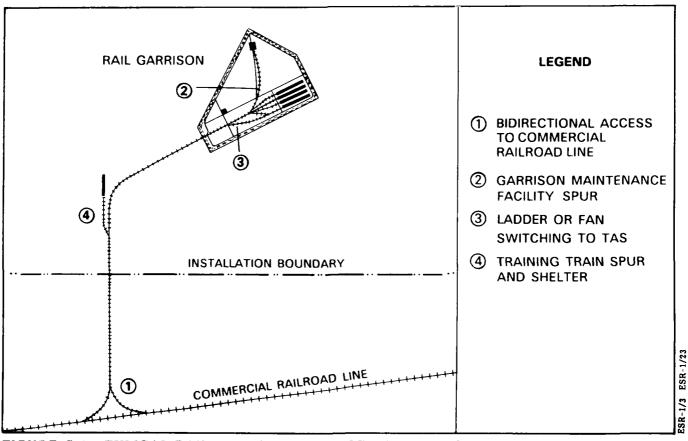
TYPICAL RAIL NETWORK CONNECTING GARRISON FACILITIES TO THE COMMERCIAL RAILROAD LINE
